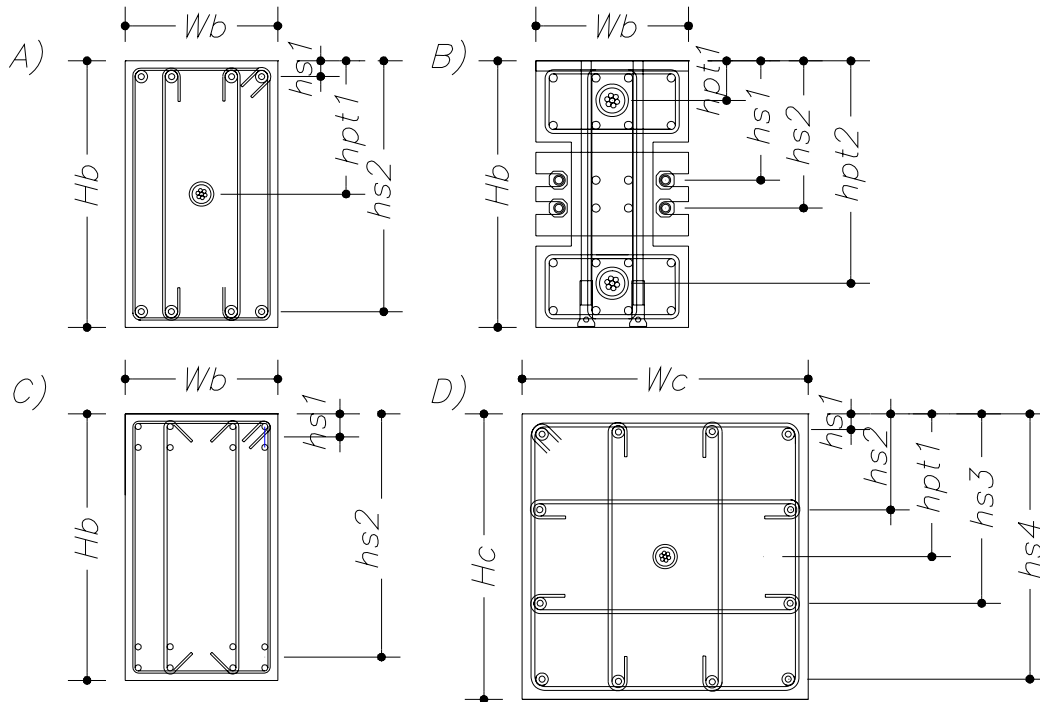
Beam and Column section details: A) Hybrid PRESSS, B) Hybrid Non-tearing, C) Monolithic and D) Column base.
